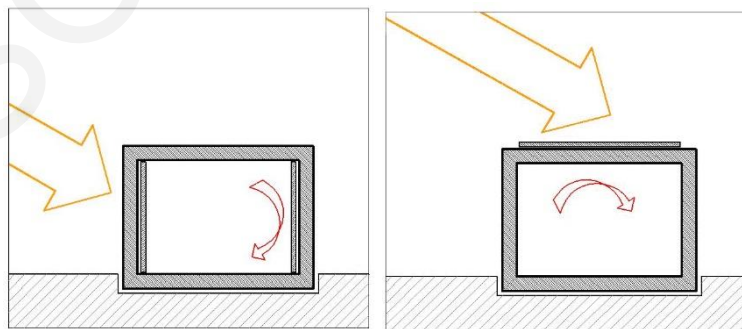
Design illustration of internal thermal insulation on the wall and external thermal insulation on the roof of the building [38].
